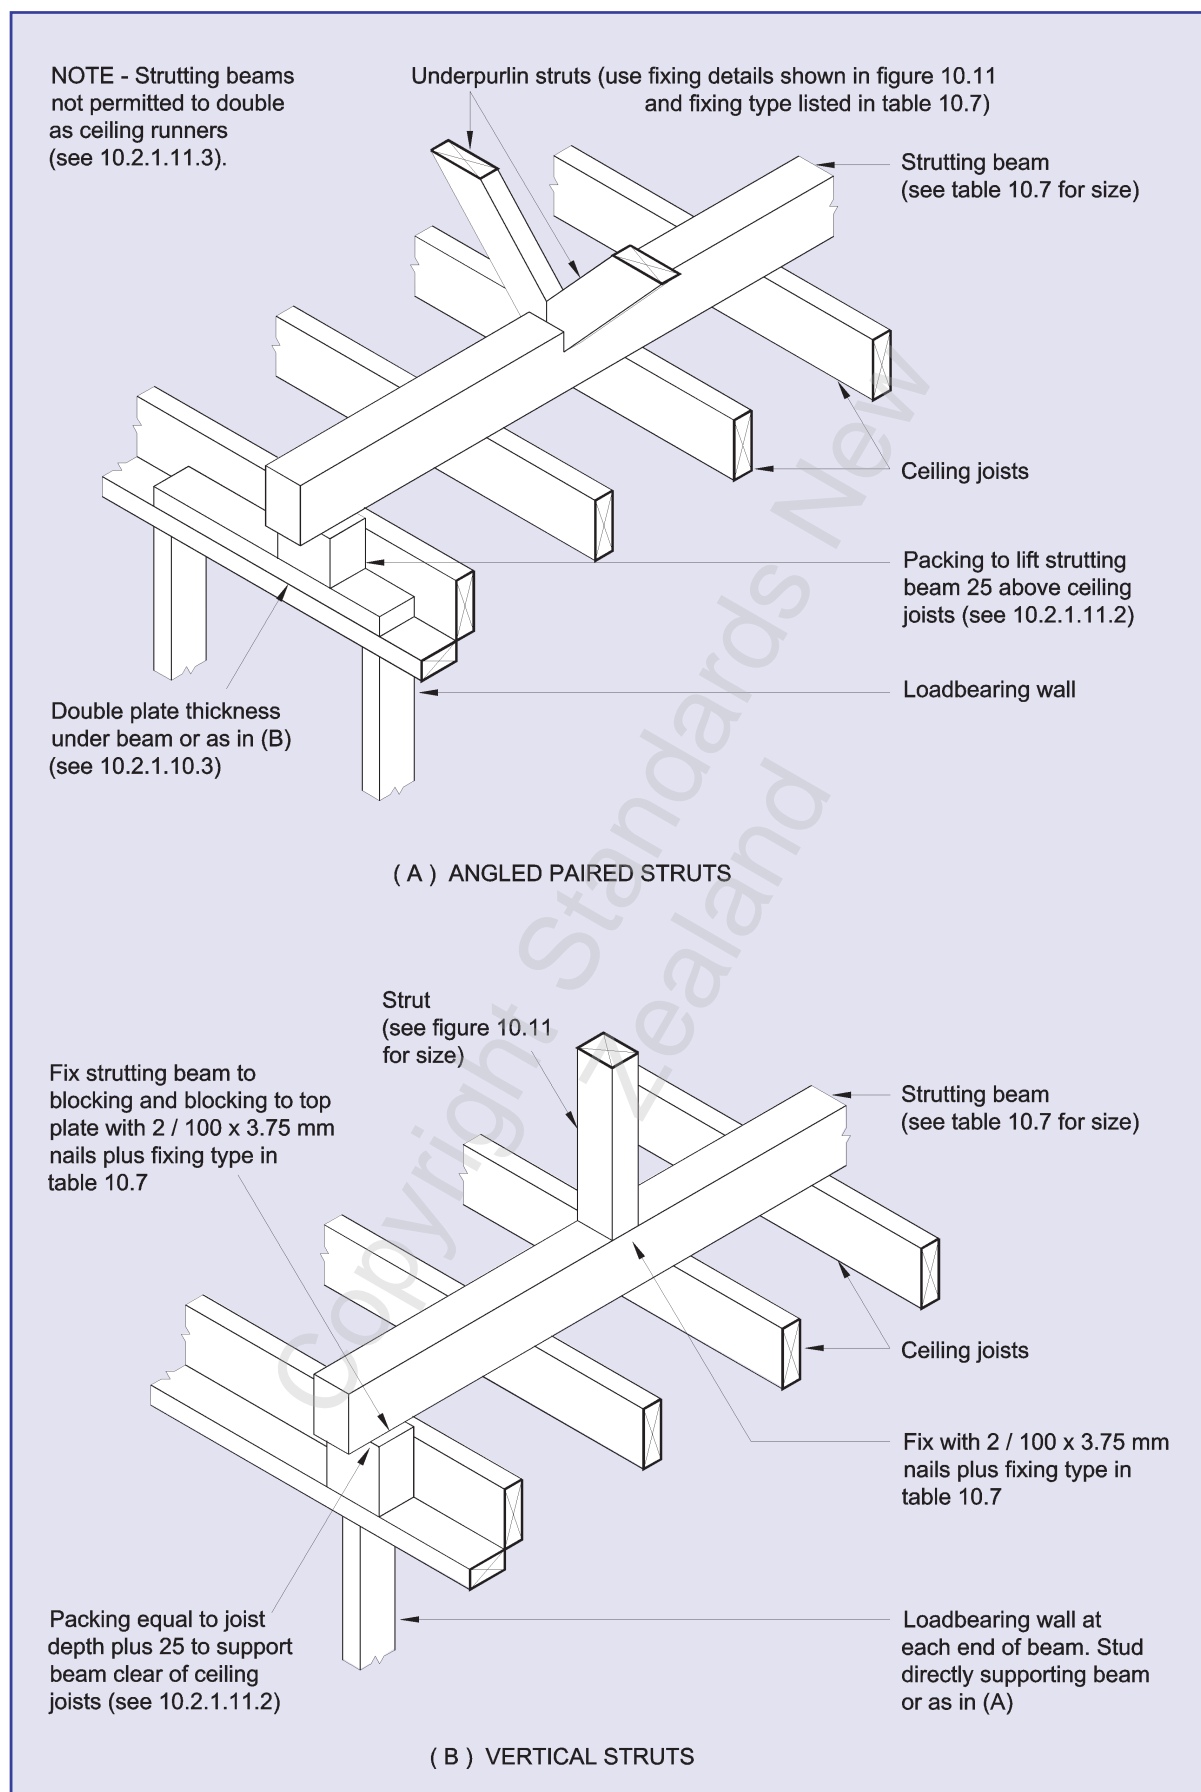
Strutting beams (see 10.2.1.11.1)
